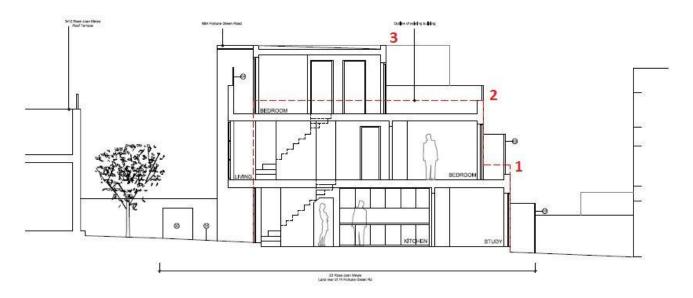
Section Through Proposal – Rose Jean Mews shown to left and Fortune Green Road Properties to Right
